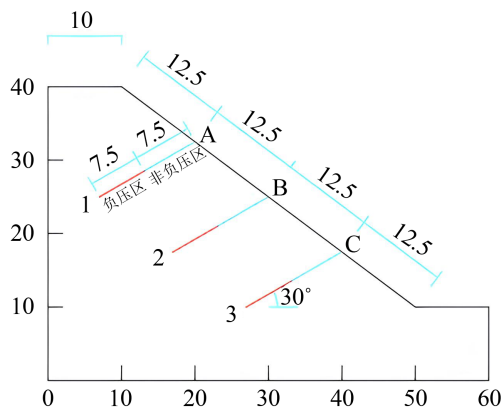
Drainage pipe arrangement under rainfall conditions (unit: m)
